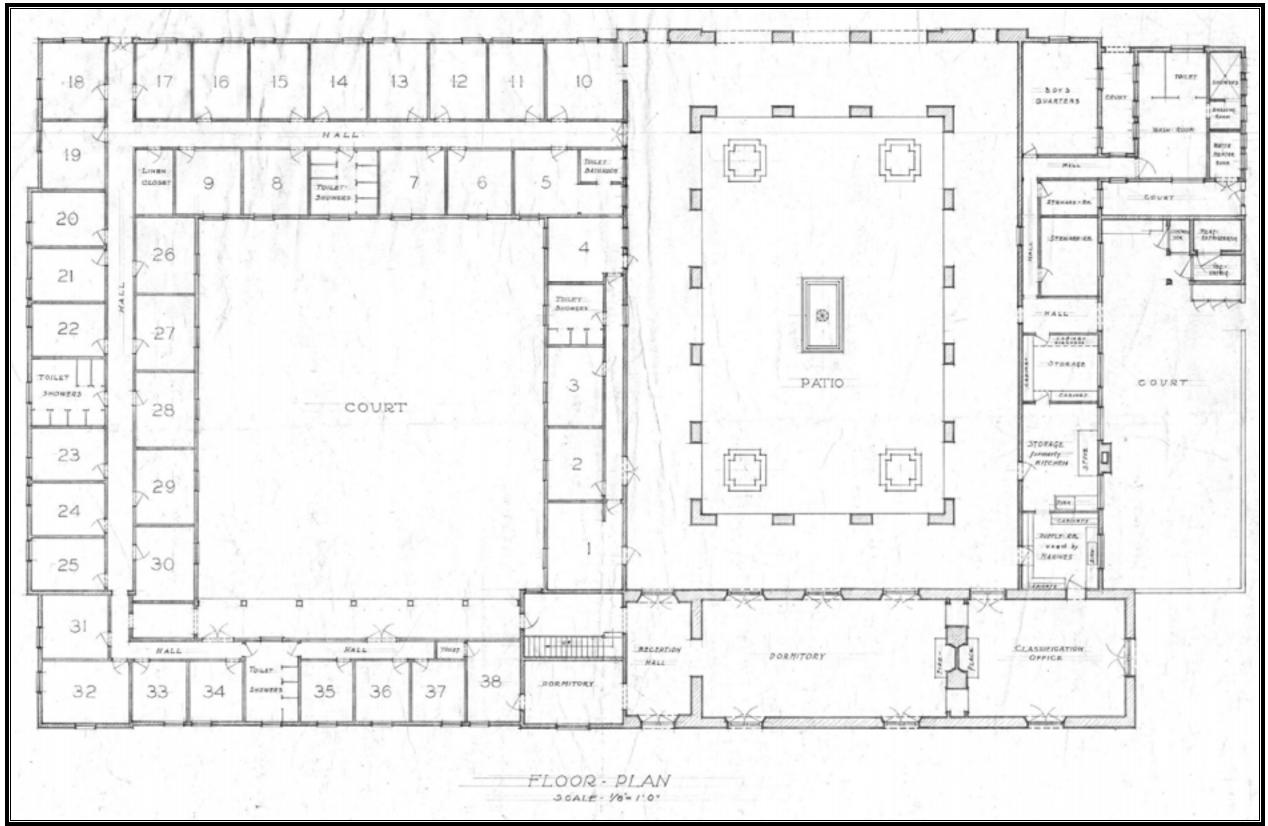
F-troop building, 1943 (Courtesy of Naval Air Station North Island)
